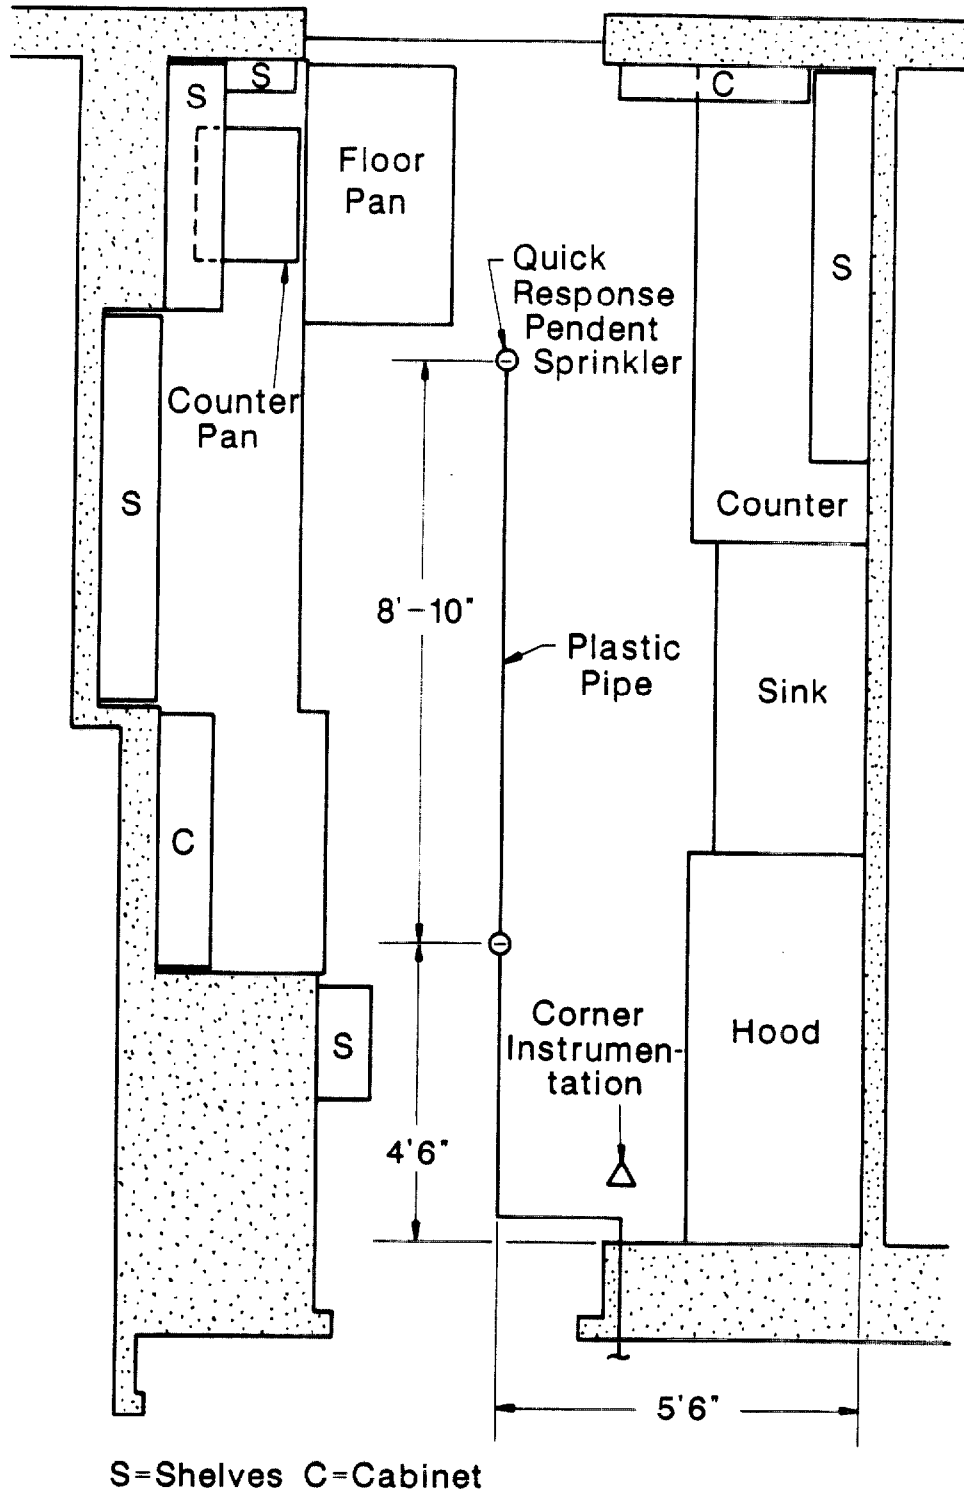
Laboratory plan for test with quick response pendent sprinkler, plastic piping
